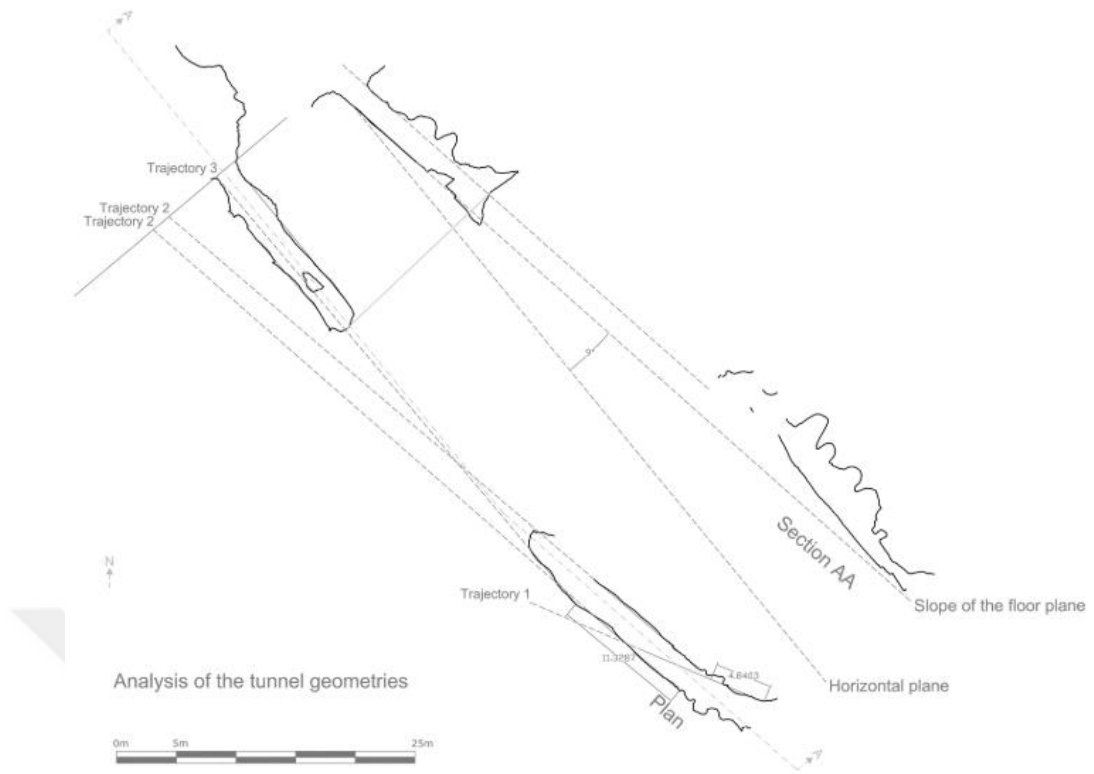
Cross-sections of the Büyükkaya tunnel (Repola, 2020)
